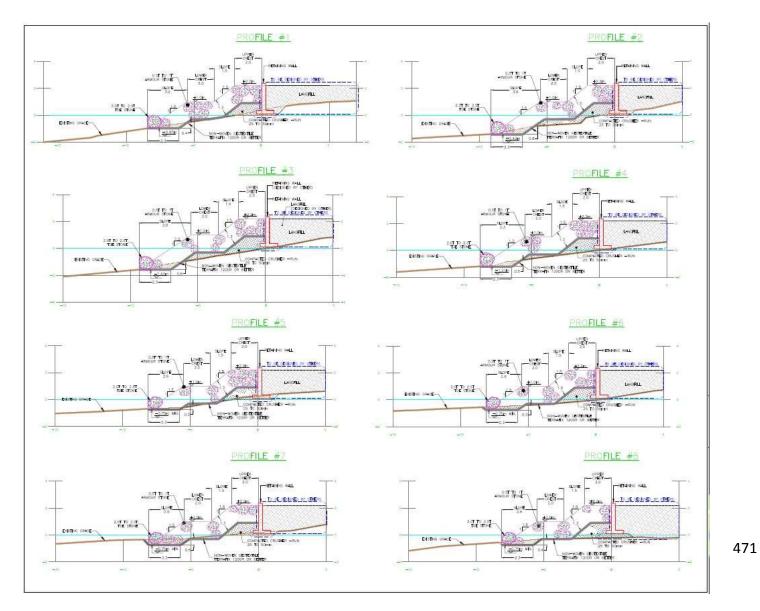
Cross-sections for armour stone revetment sheet 1
